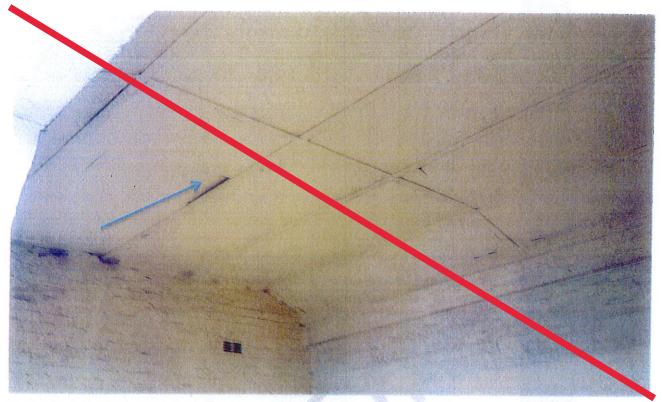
Asbestos cement sheeting, with a small crack, on the ceiling lining of Blackheath Shelter Shed (near crossing).
